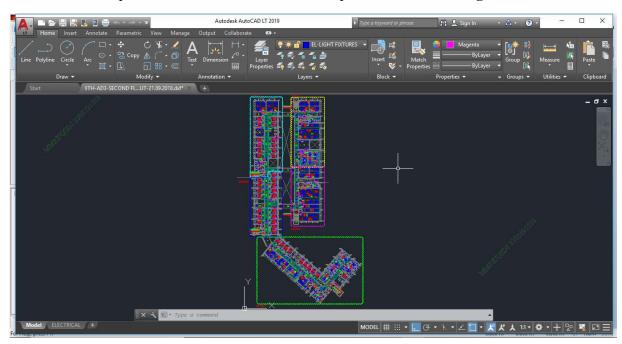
CAD drawing, opened in AUTOCAD 2019
